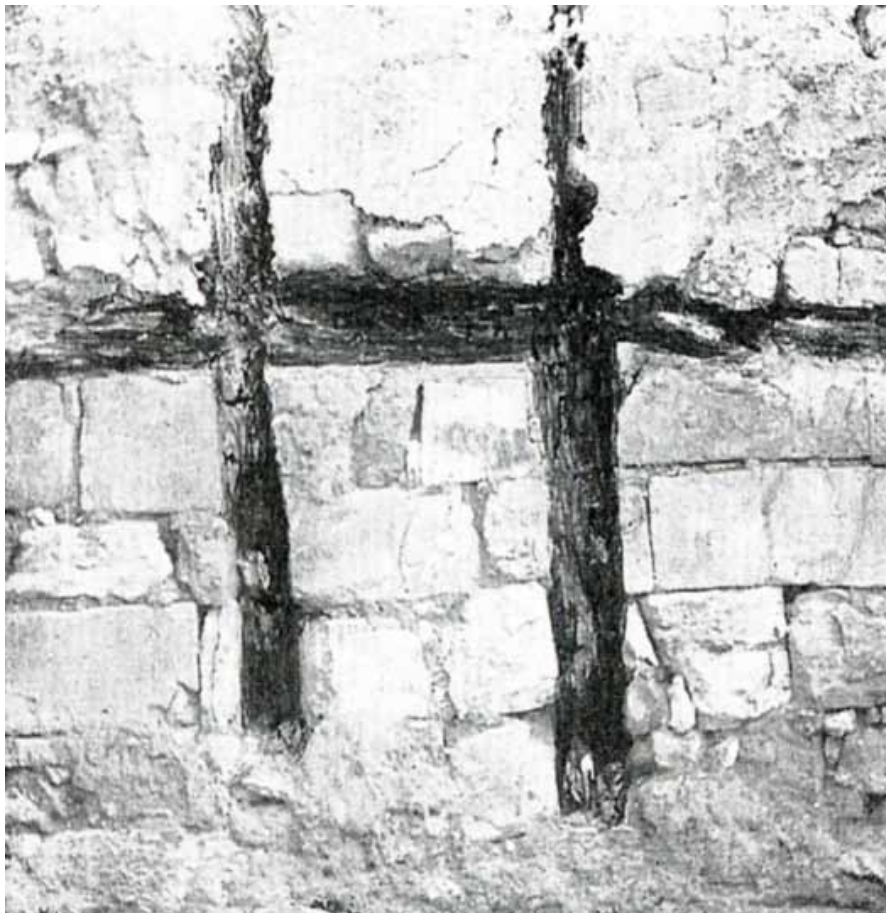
wood-frame in a wall at Knossos palace (EVANS, 1928)
